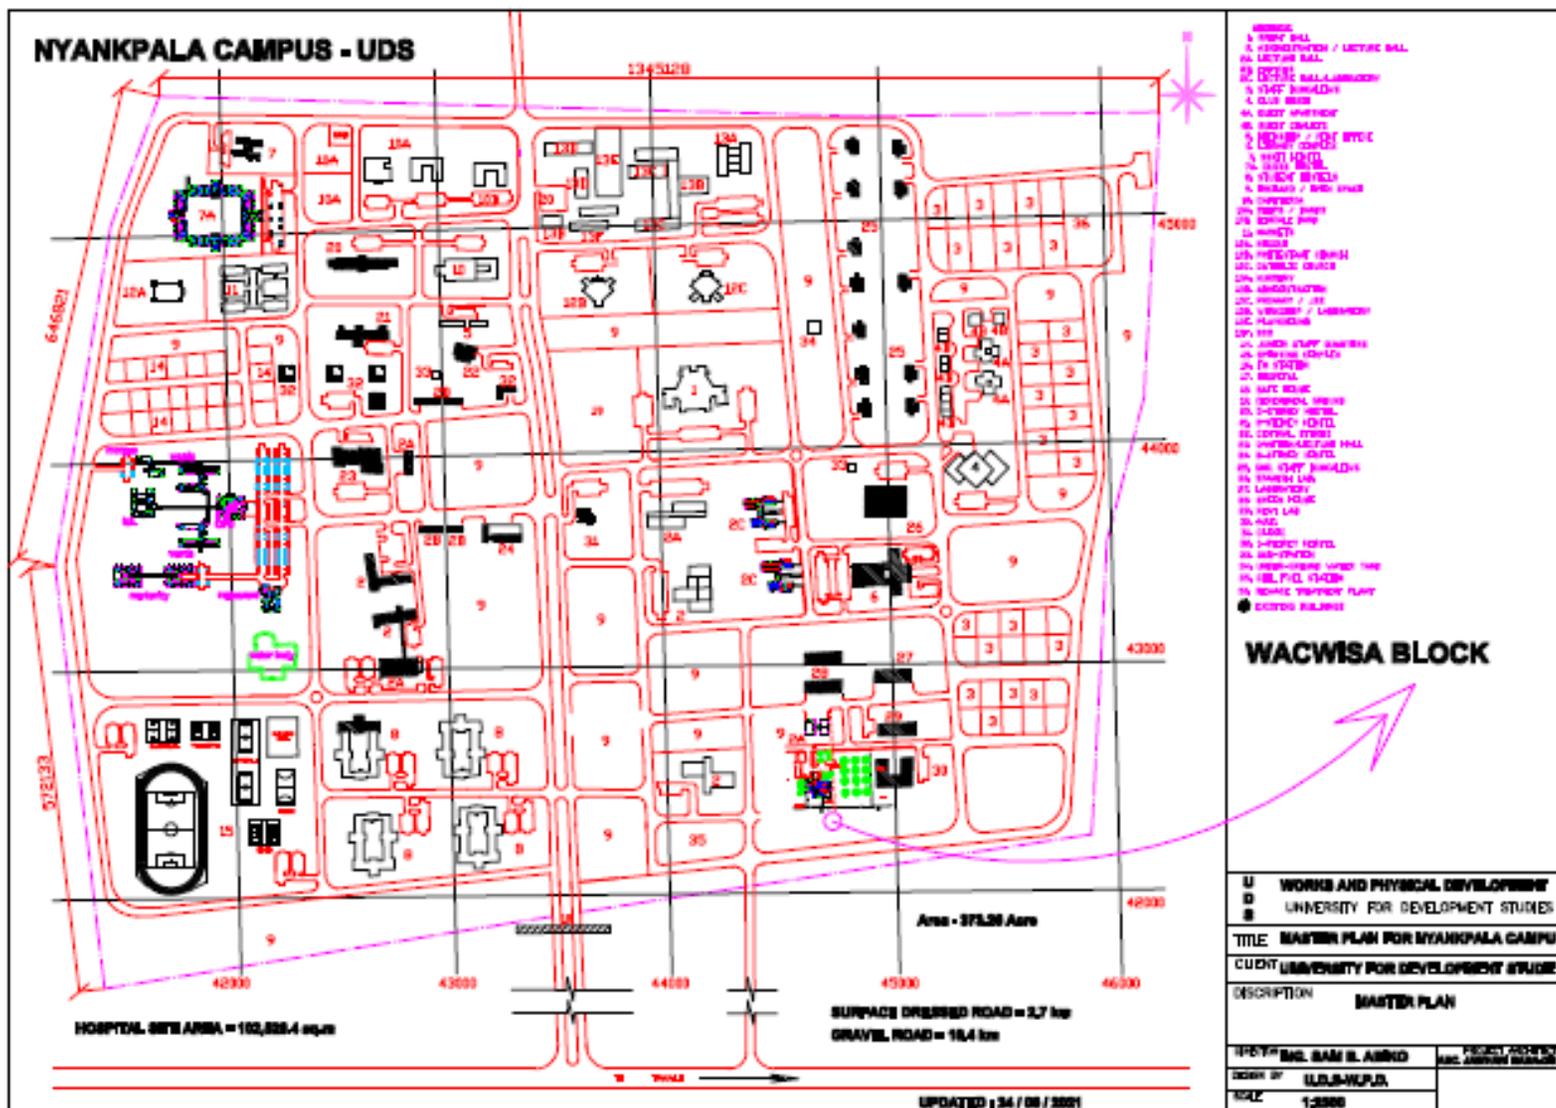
Site Plan of Nyankpala Campus Showing Site for Construction of WACWISA Block
